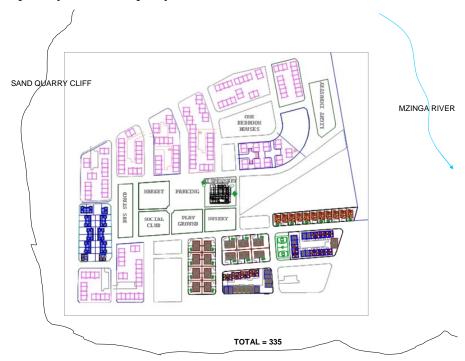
Topographic layout plan for Chamazi project (CCI, 2009)
